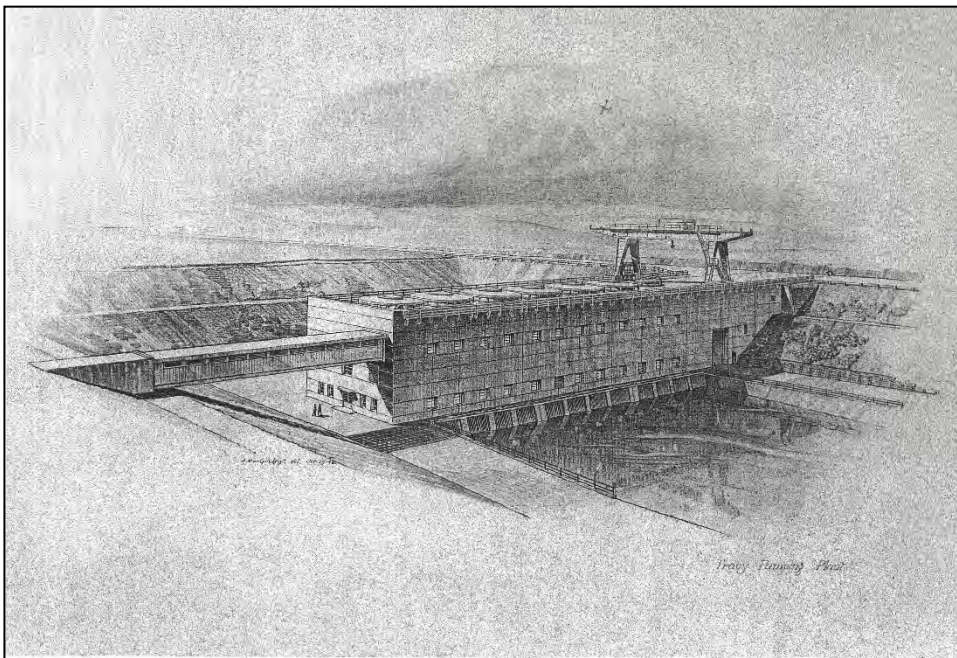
Artist rendering of Tracy Pumping Plant, 1948.
